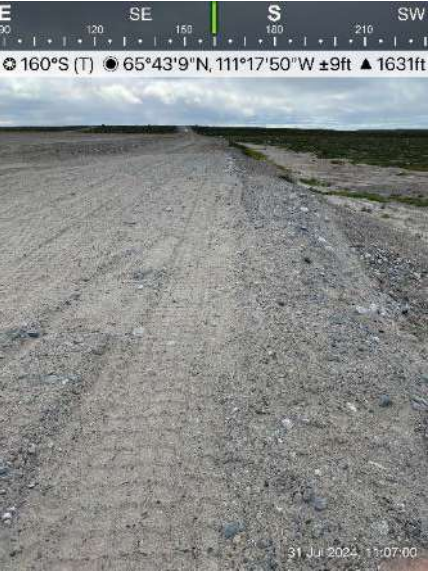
Overview of the crest, downstream embankment, and toe area at Dam 6.
